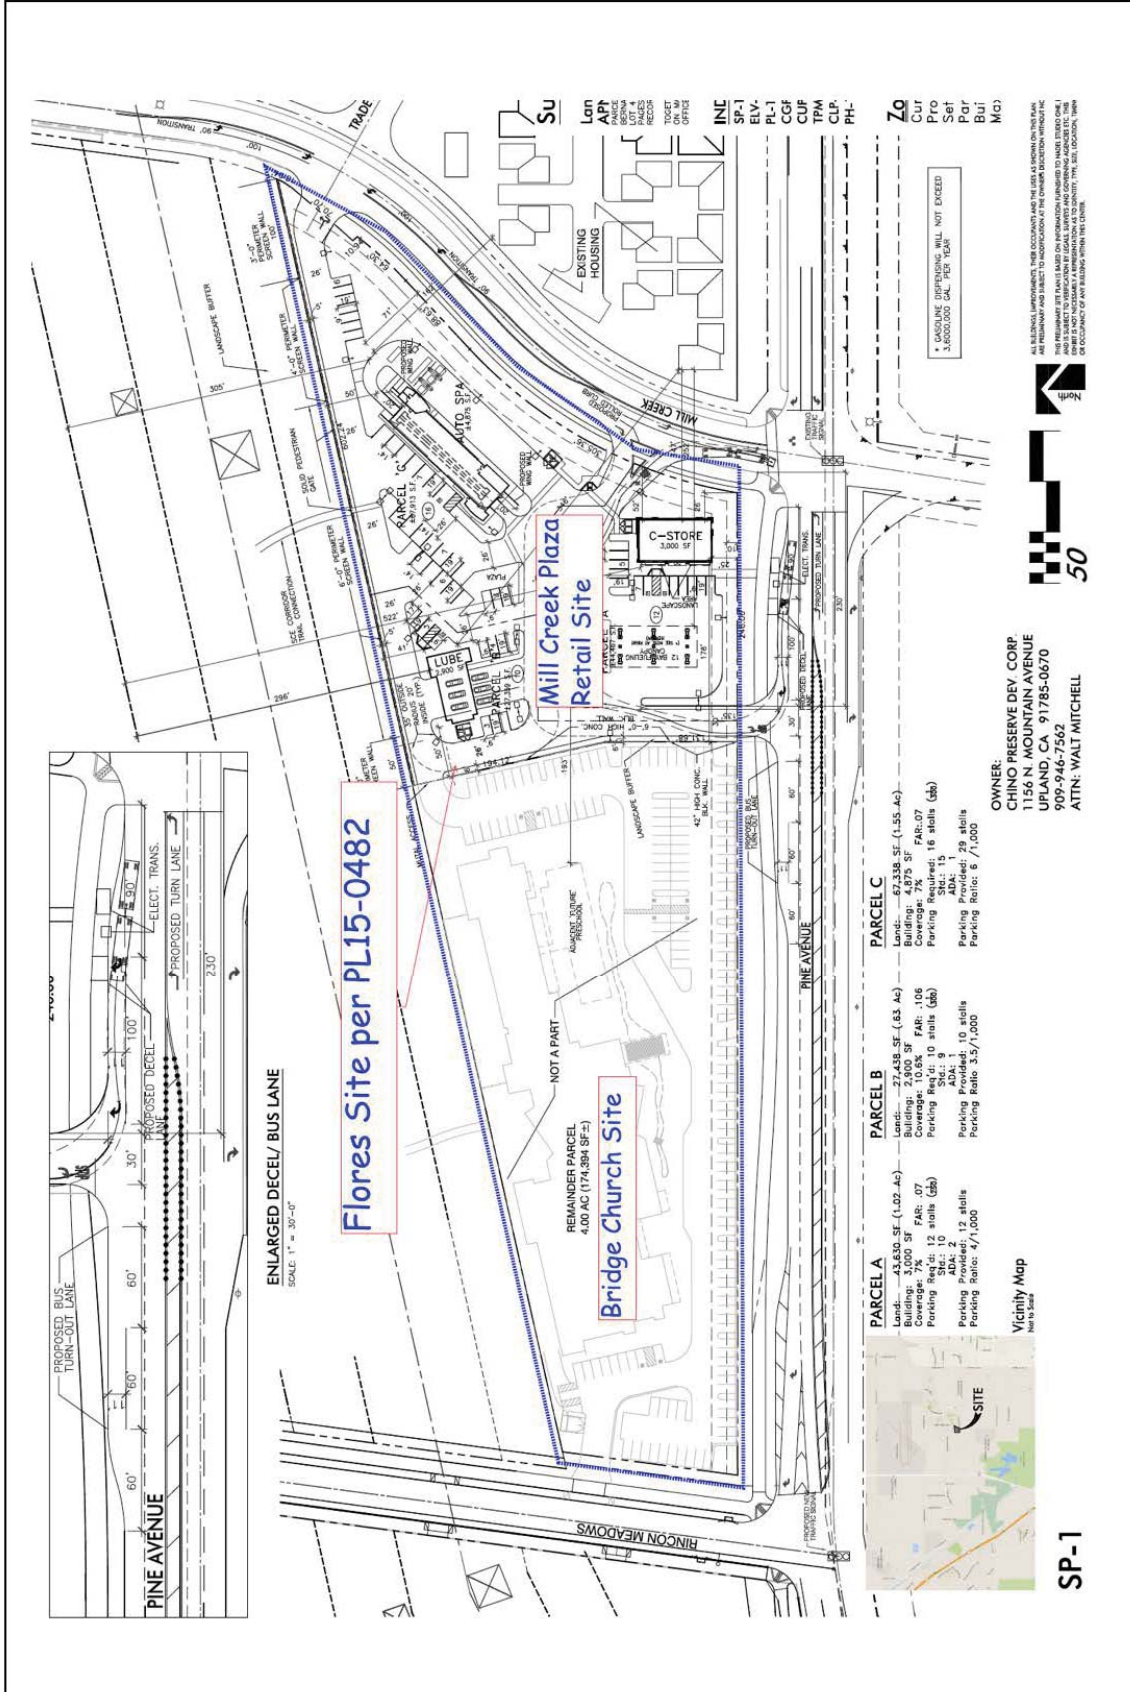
Flores Site with the Bridge Community Church and Mill Creek Plaza Retail
